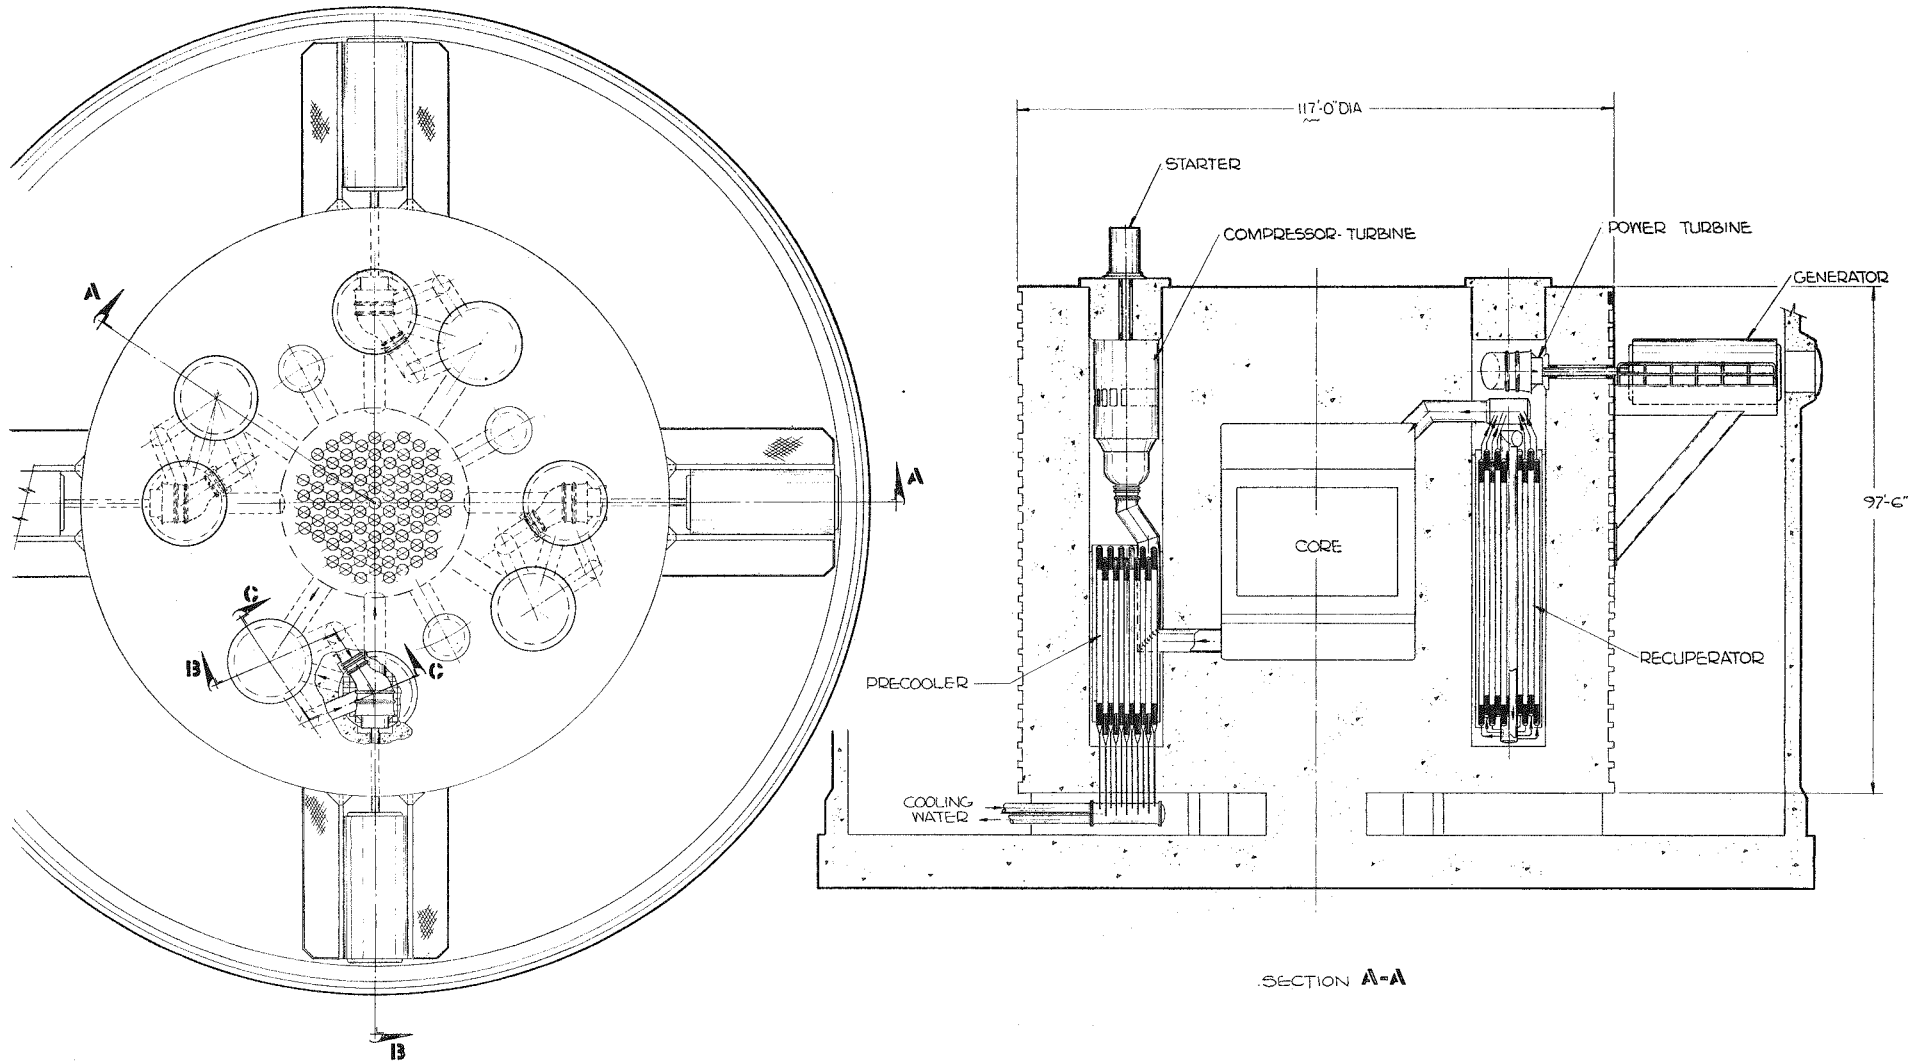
Plant Configuration 1. Showing Split-Shaft Turbomachinery and Horizontal Generator
